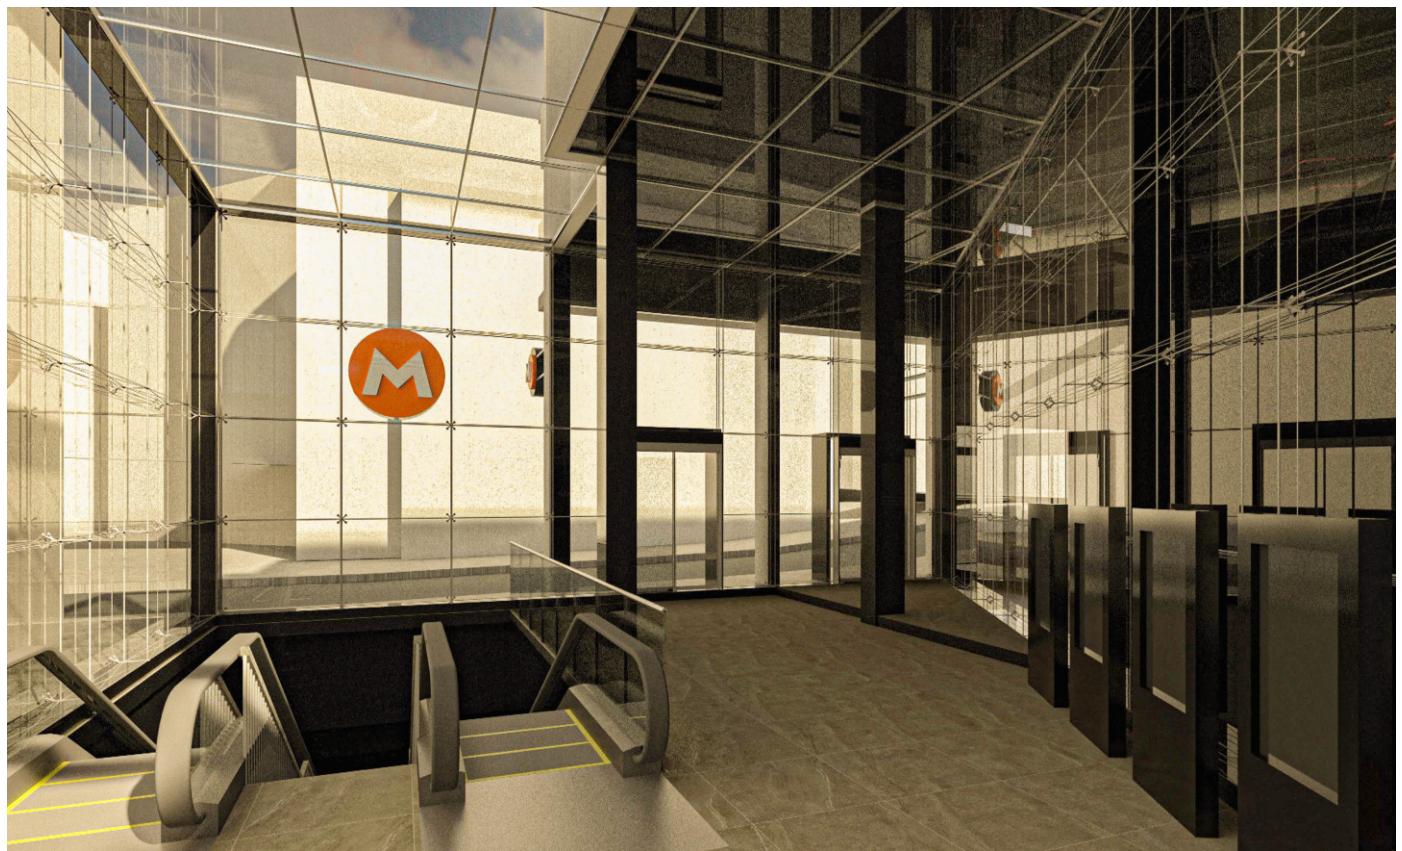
Honigmann House, entrance to metro station, facing street.
